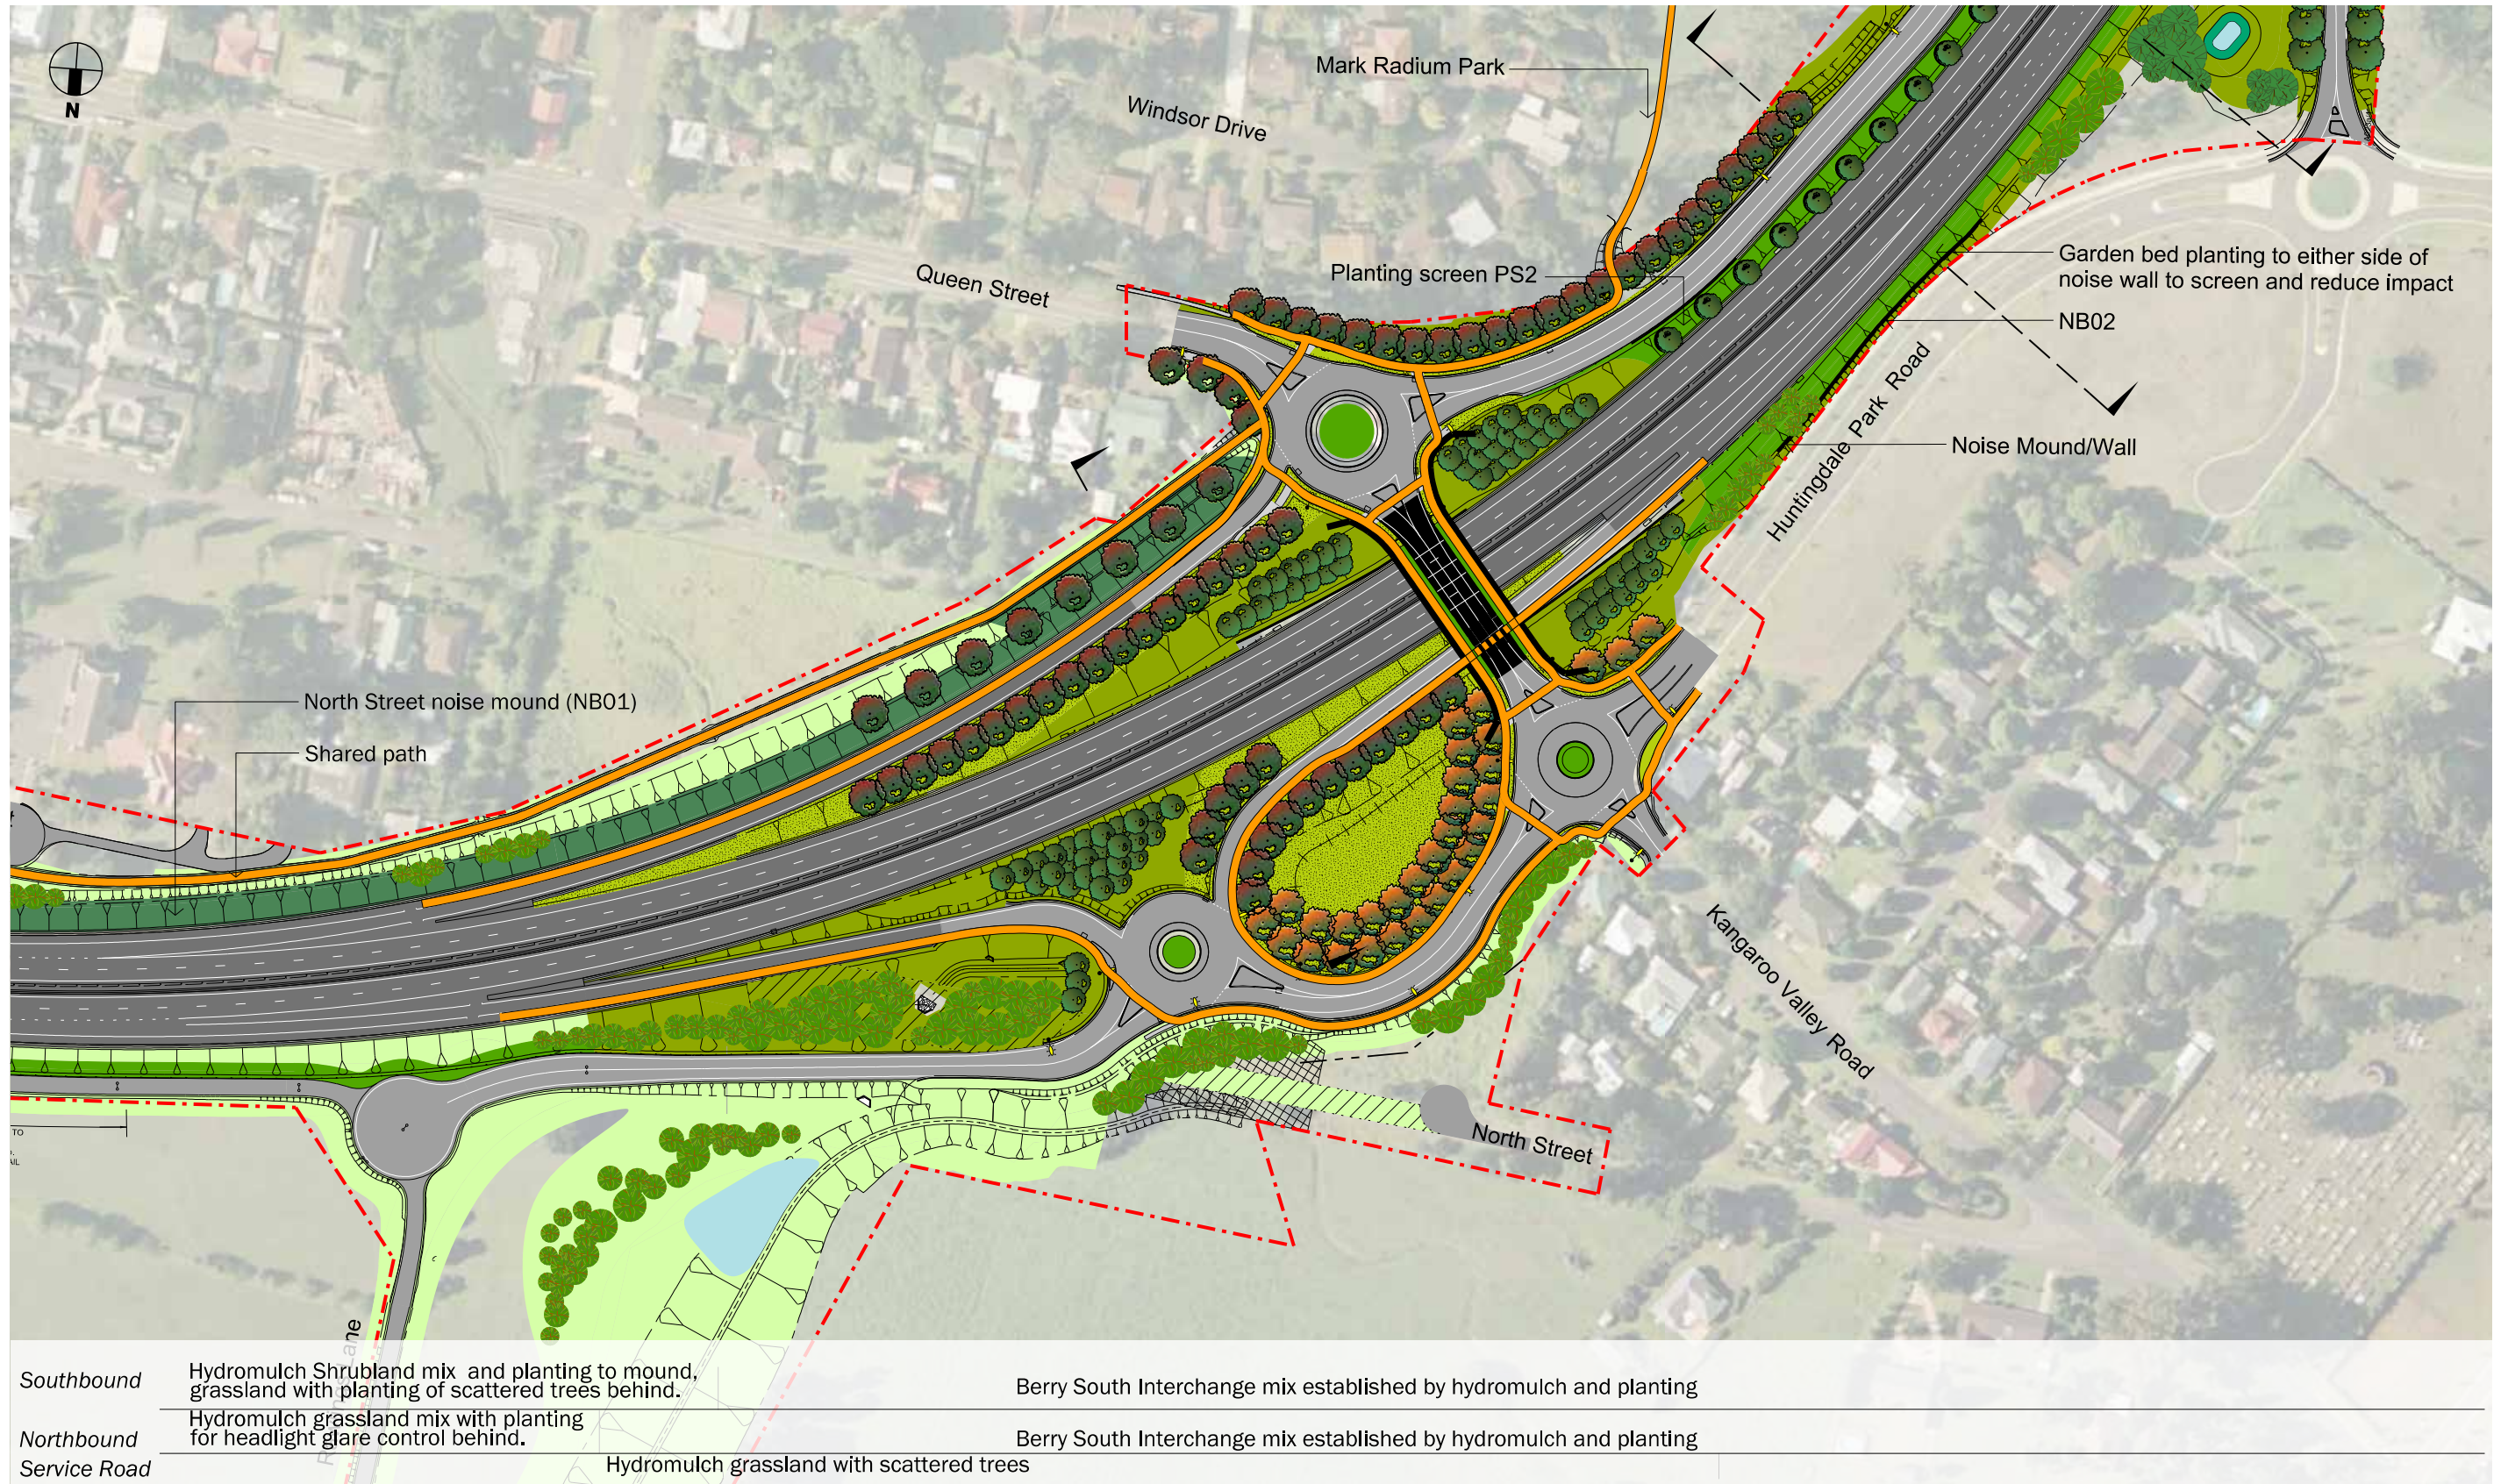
Urban and landscape design plan (Sheet 18) - Berry Character Zone
